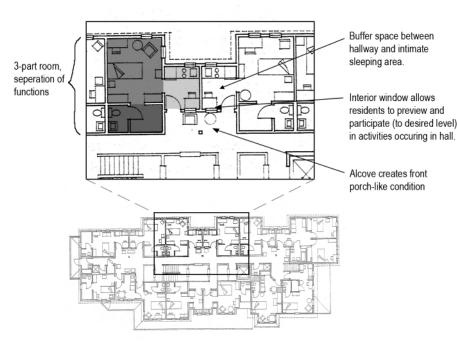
Second Floor Plan of the Eldridge House -a group home for Seniors (N.T.S.).
